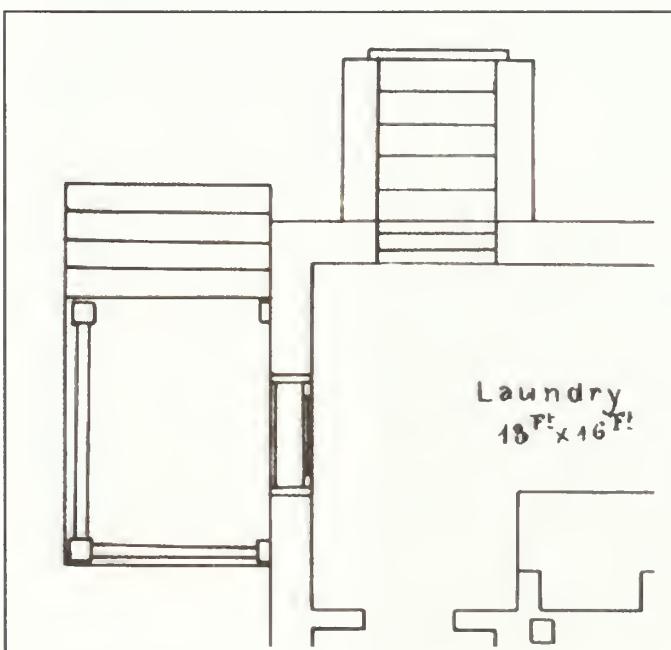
Officers Club, south- elevation entry to rear ell, 1878.
